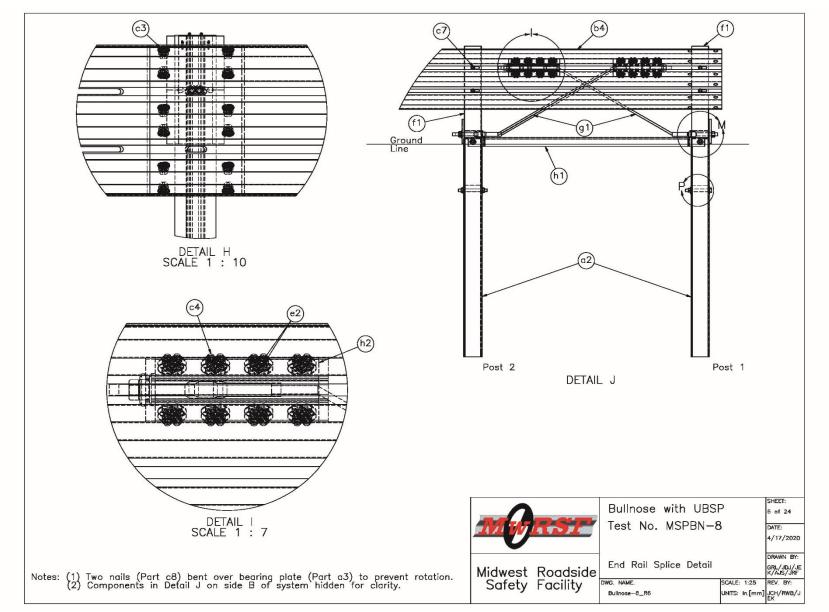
End Rail Splice Detail, Test No. MSPBN-8
